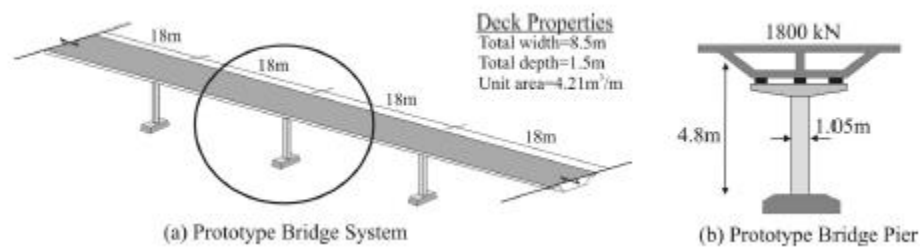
Prototype Bridge Pier (Marriott, 2009)
